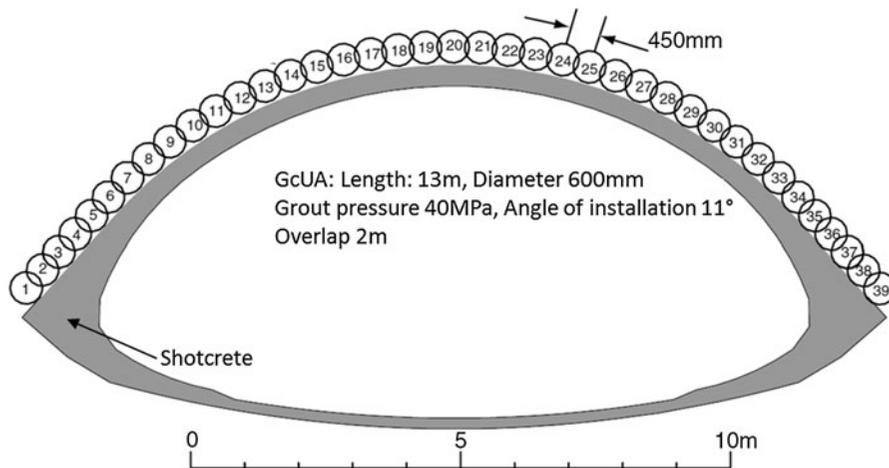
Top-heading excavation showing jet-grout column numbering at the Aeschertunnel (modified after Coulter and Martin 2006)
